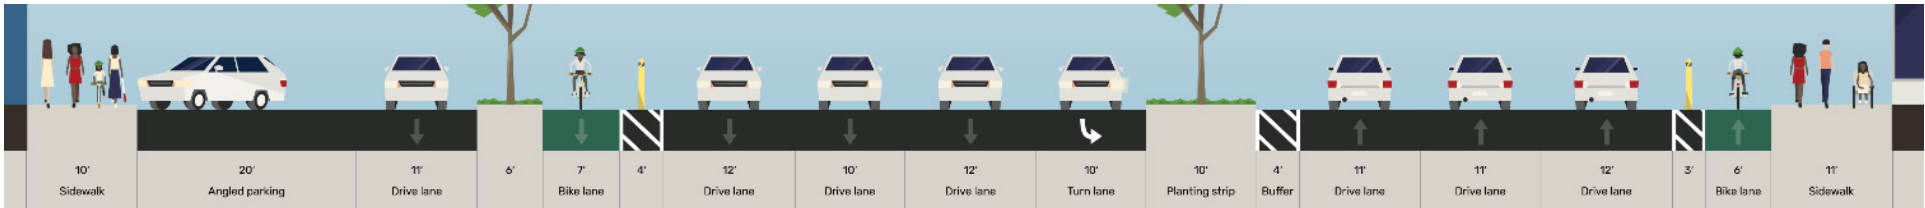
Proposed cross-section: Hawthorne Blvd from W 120th St to W Broadway
